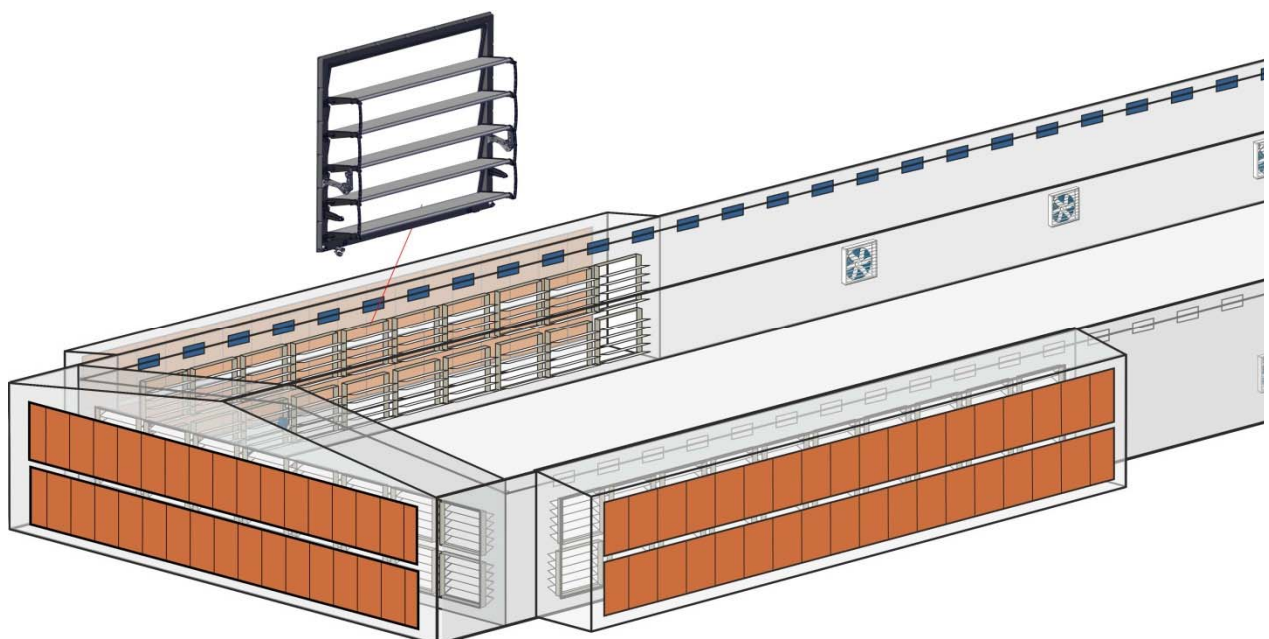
Drawing of DA 17K Tunnel inlet, double row
